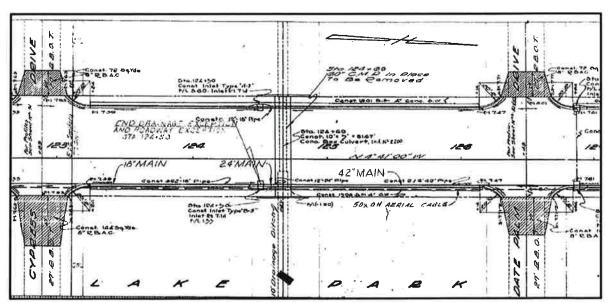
FDOT 1969 Plans for US Highway#1 Drainage Installation along Town of Lake Park
